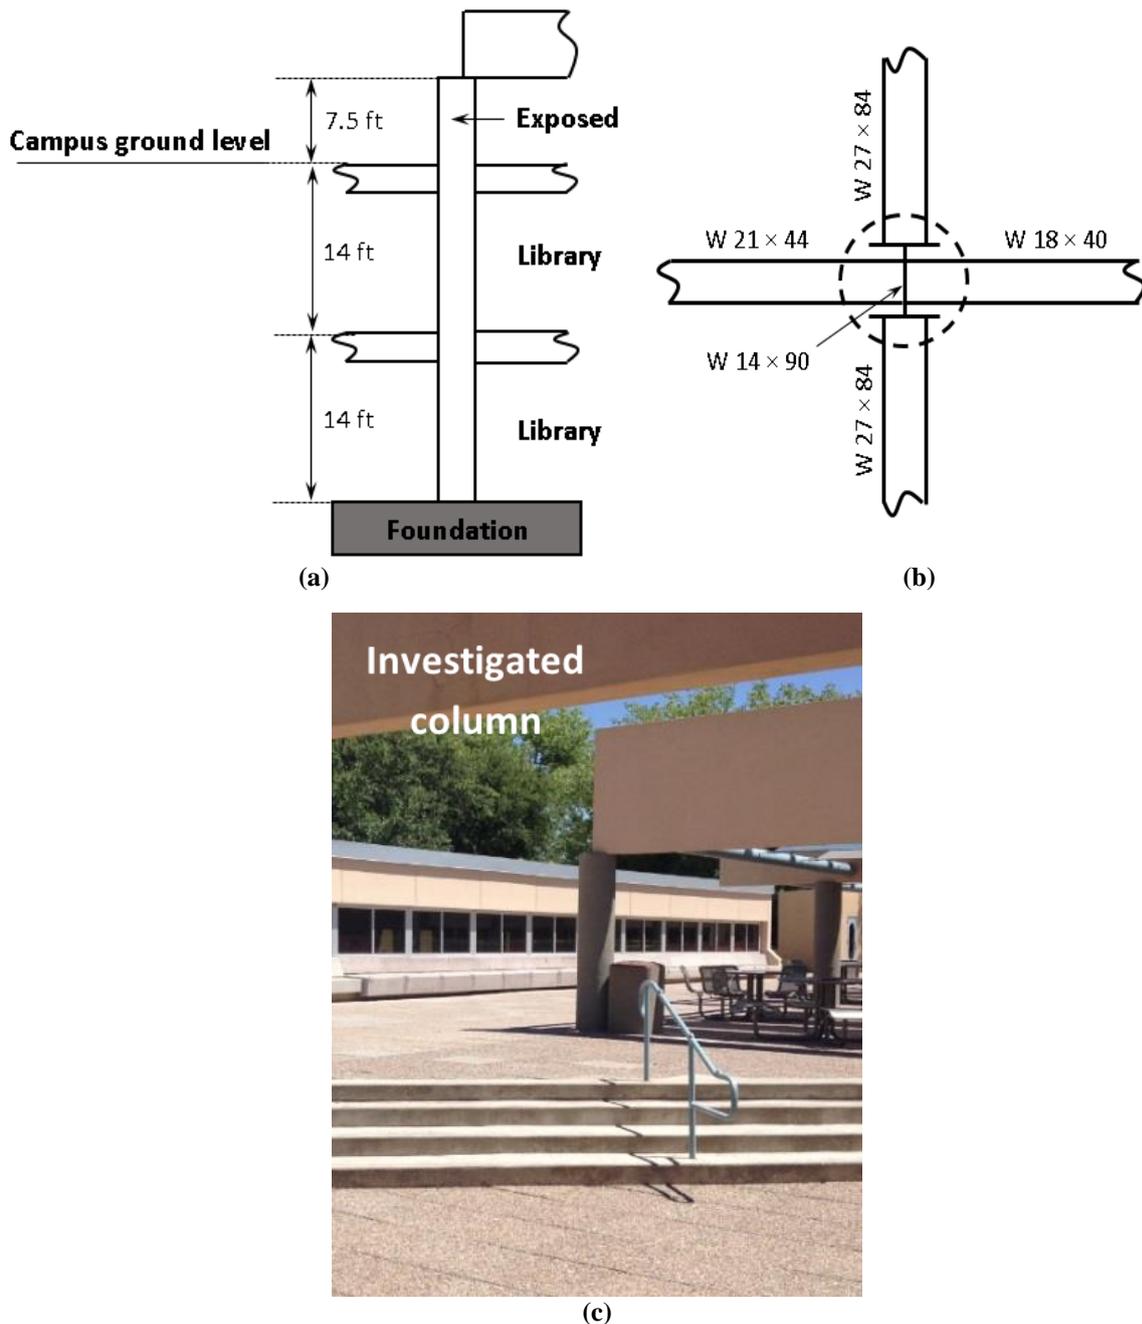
The concrete column of centennial library on UNM campus: a) Elevation, b) Cross section plan and; c) Exposed part
